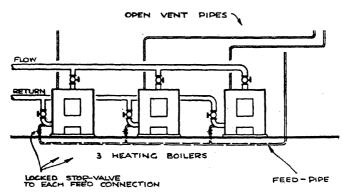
Open Vent Pipes for Battery of Heating Boilers.
